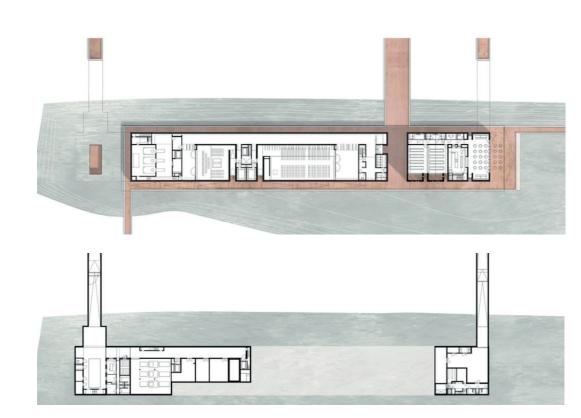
Floor plans, Hofheide crematorium, RCR architects (2015) • Source: El Croquis
